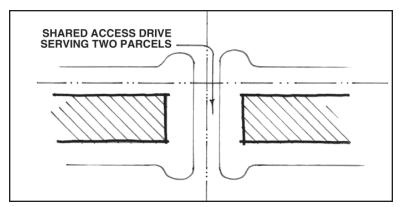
Shared parking lots and joint access drives, as shown in the figure above, are encouraged in the UDO.
